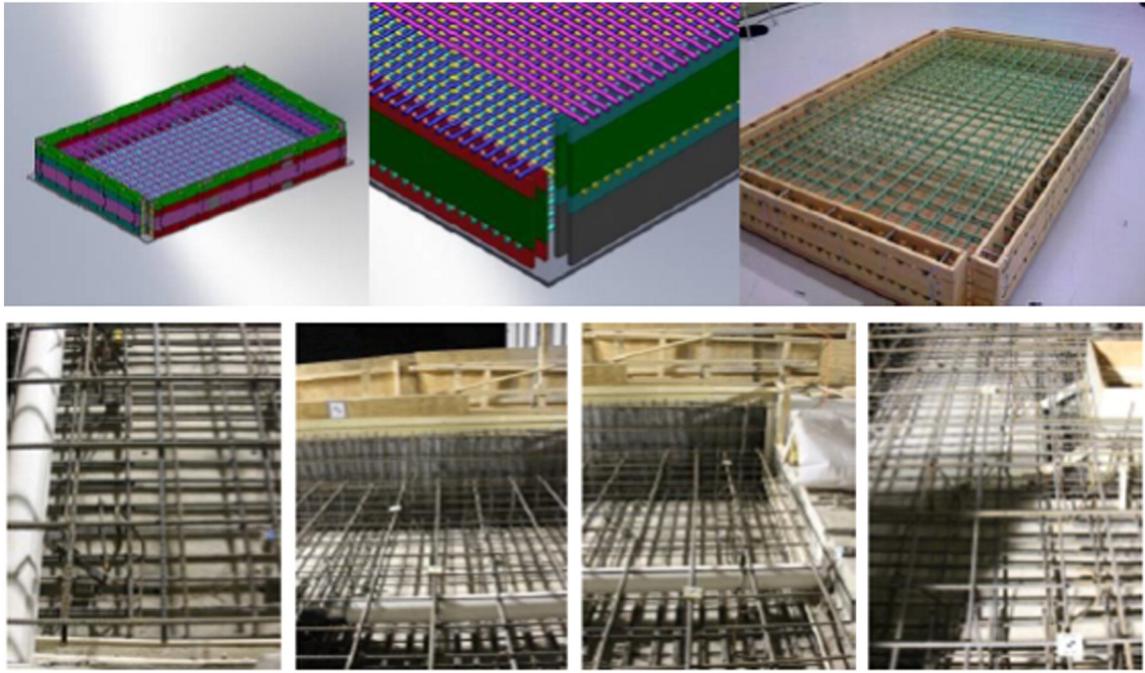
The reinforcement rebar cage 3D CAD model, as-built product, and unordered pictures of a railway deck rebar cages it represents.
